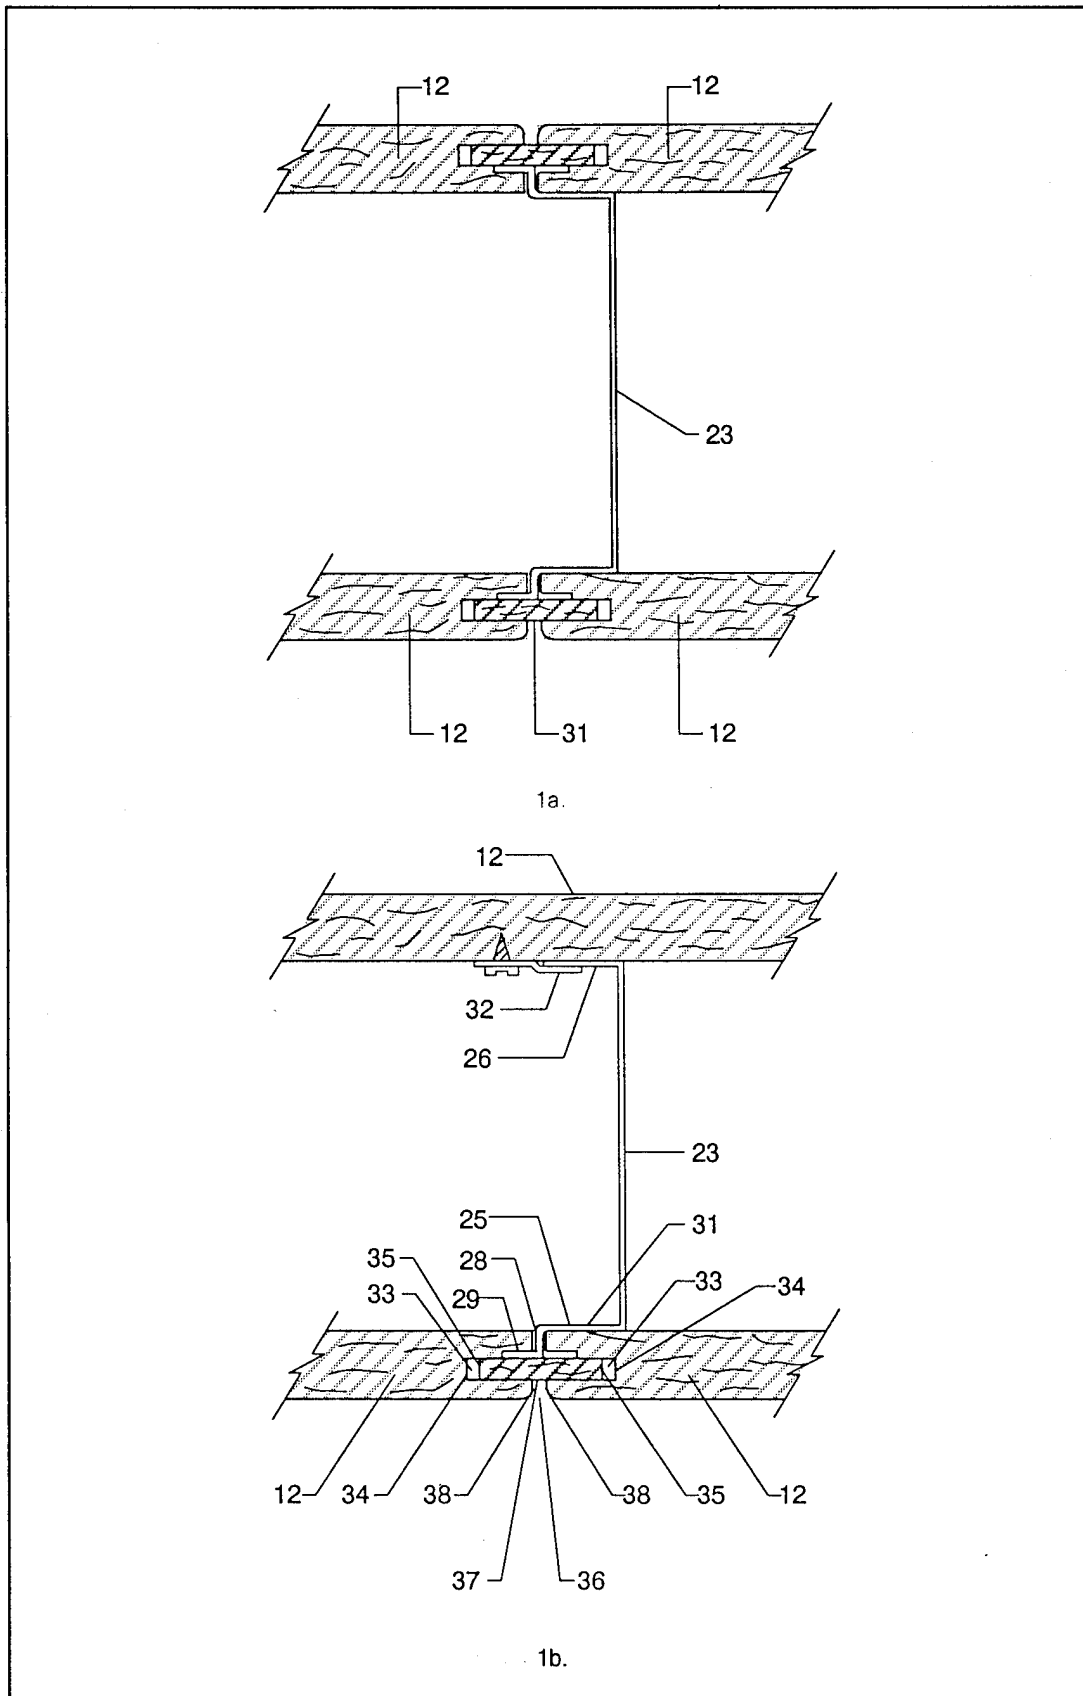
Original patented Building Assembly Systems (BAS) concepts. (a) cross-sectional view showing boards with dado milled edges and spline connector, (b) spline connector showing screw attachment to backside of sheathing board.
